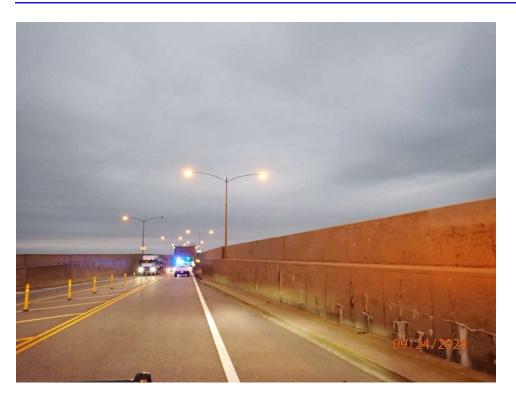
Portal Island 3 Approach Roadway and Approach Wall; vertical and transverse cracks in approach wall with efflorescence.
